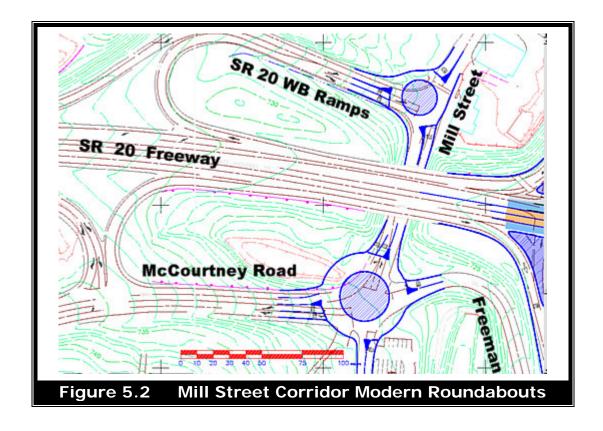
was created in AutoCAD and depicts a system of two modern roundabouts for the Mill Street corridor from McCourtney Road to the SR 20 WB Ramp intersection. Full engineering D size drawings of this figure are available for download in AutoCAD Whip formats, as well as Adobe PDF formats on the <a href="https://www.prismworld.com">www.prismworld.com</a> web site.
